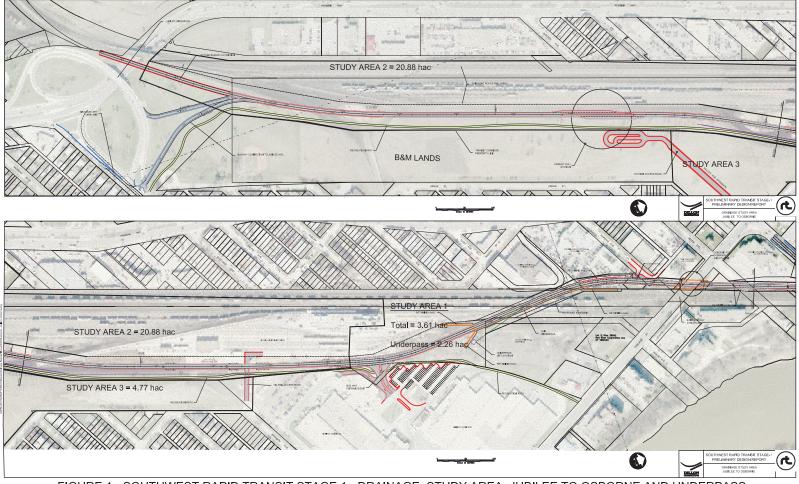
SOUTHWEST RAPID TRANSIT STAGE 1 - DRAINAGE, STUDY AREA, JUBILEE TO OSBORNE AND UNDERPASS
